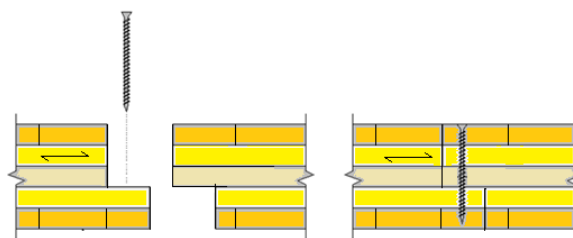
Half-lapped joint for aligned wall-to-wall or floor-to-floor connections.
